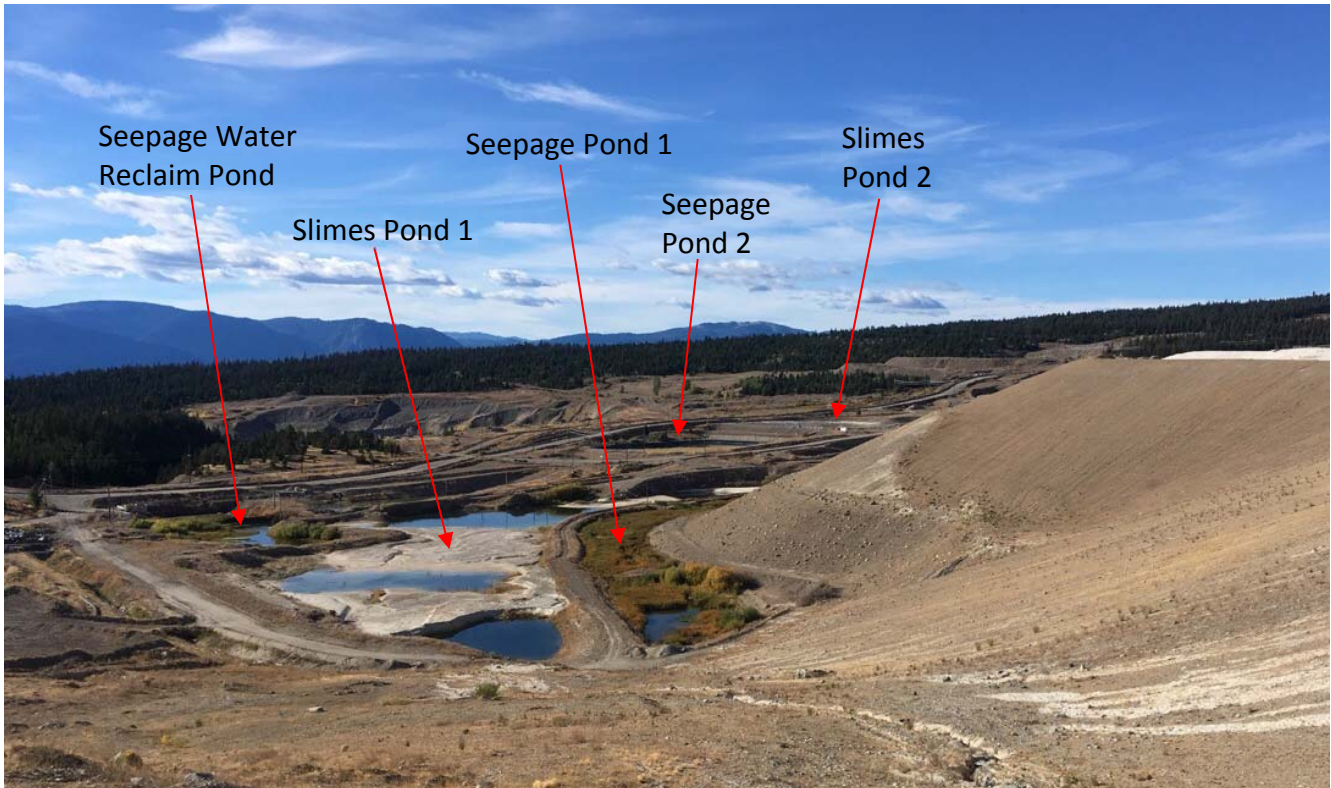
Slimes Pond 1 – Facing South (SS-2017-04)
